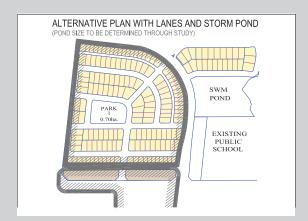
Alternative Laneway Plan for Executive Residential, Special Policy Area 15
